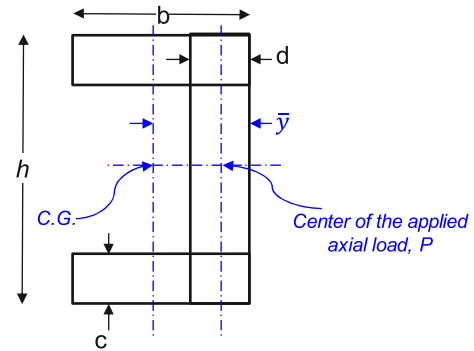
Location of centroid and centerline of axial load for C-Shaped wall specimens.
